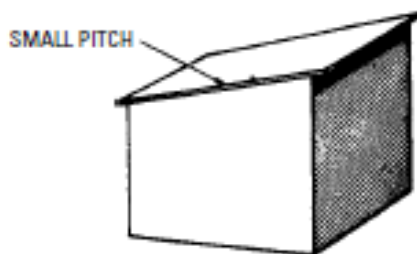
Shed or lean-to roof used on small sheds or buildings.
